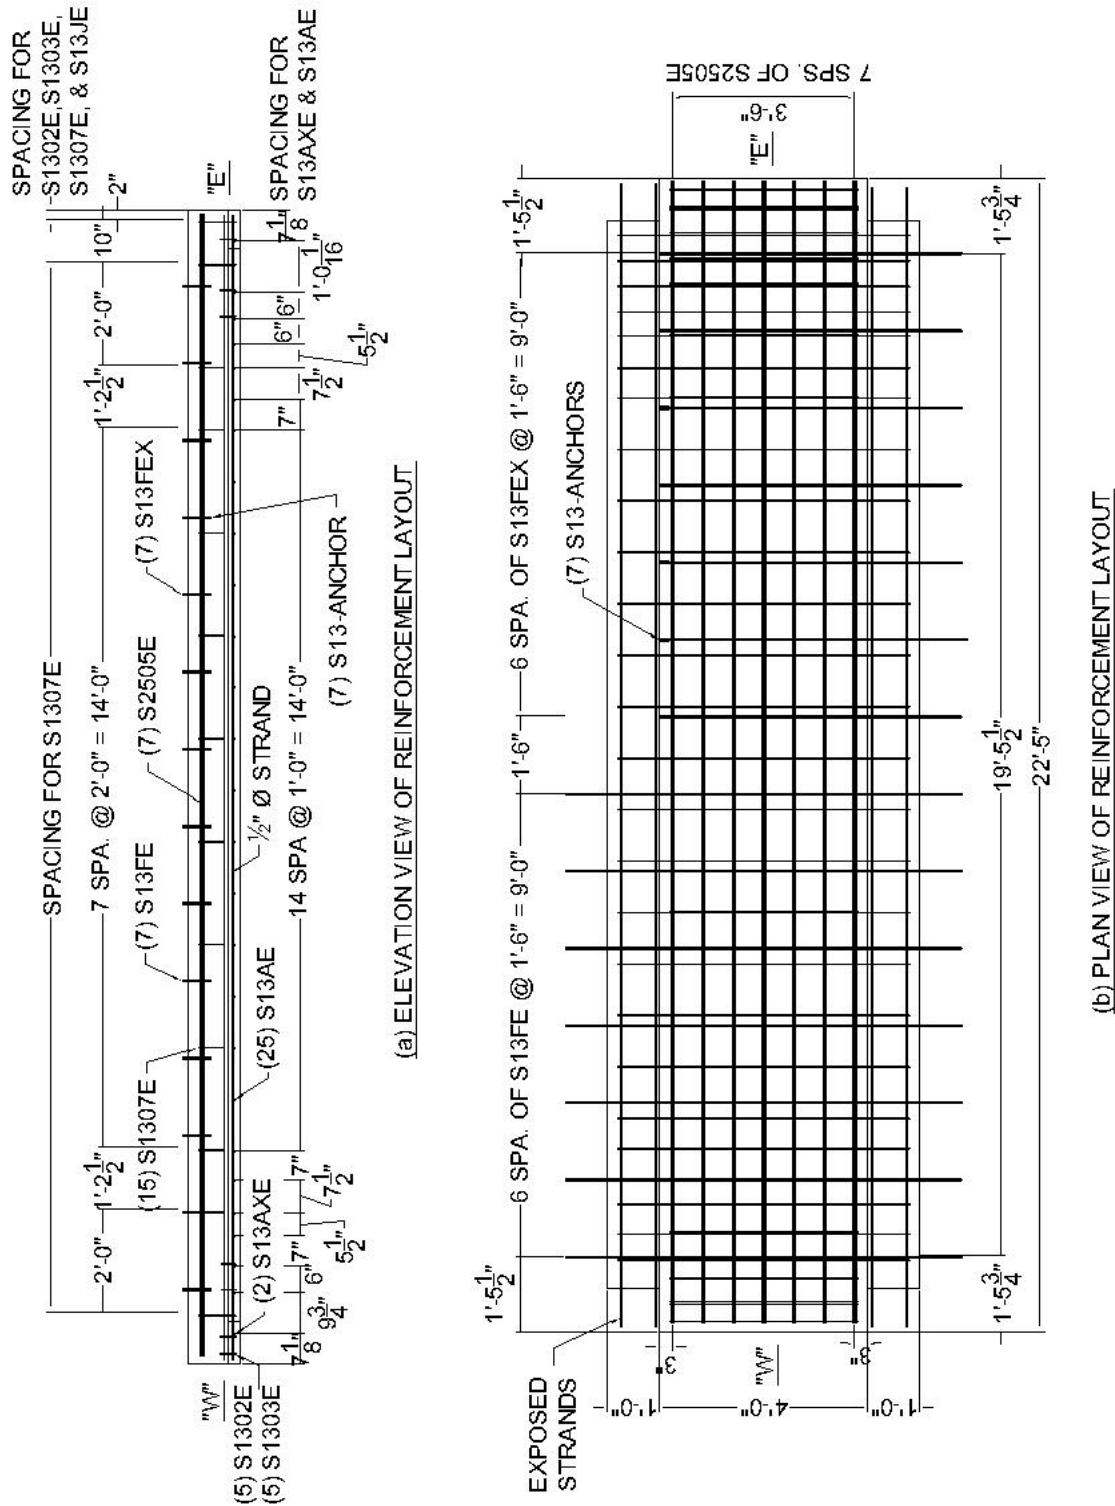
Elevation and plan views of the reinforcement layout for precast beam 1S in the Concept 2 laboratory bridge specimen
